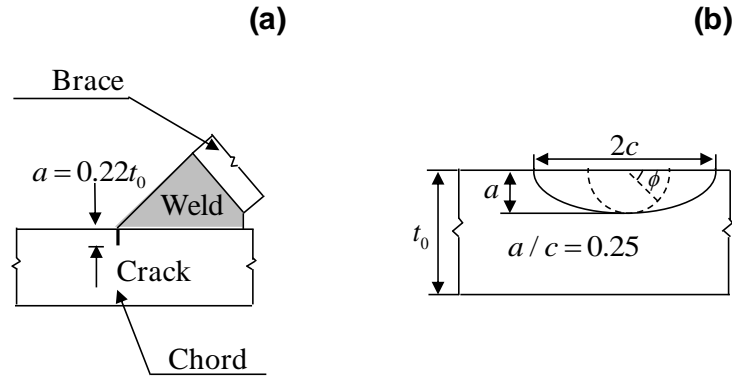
(a) Crack at the weld toe and (b) planar view of the surface crack.
